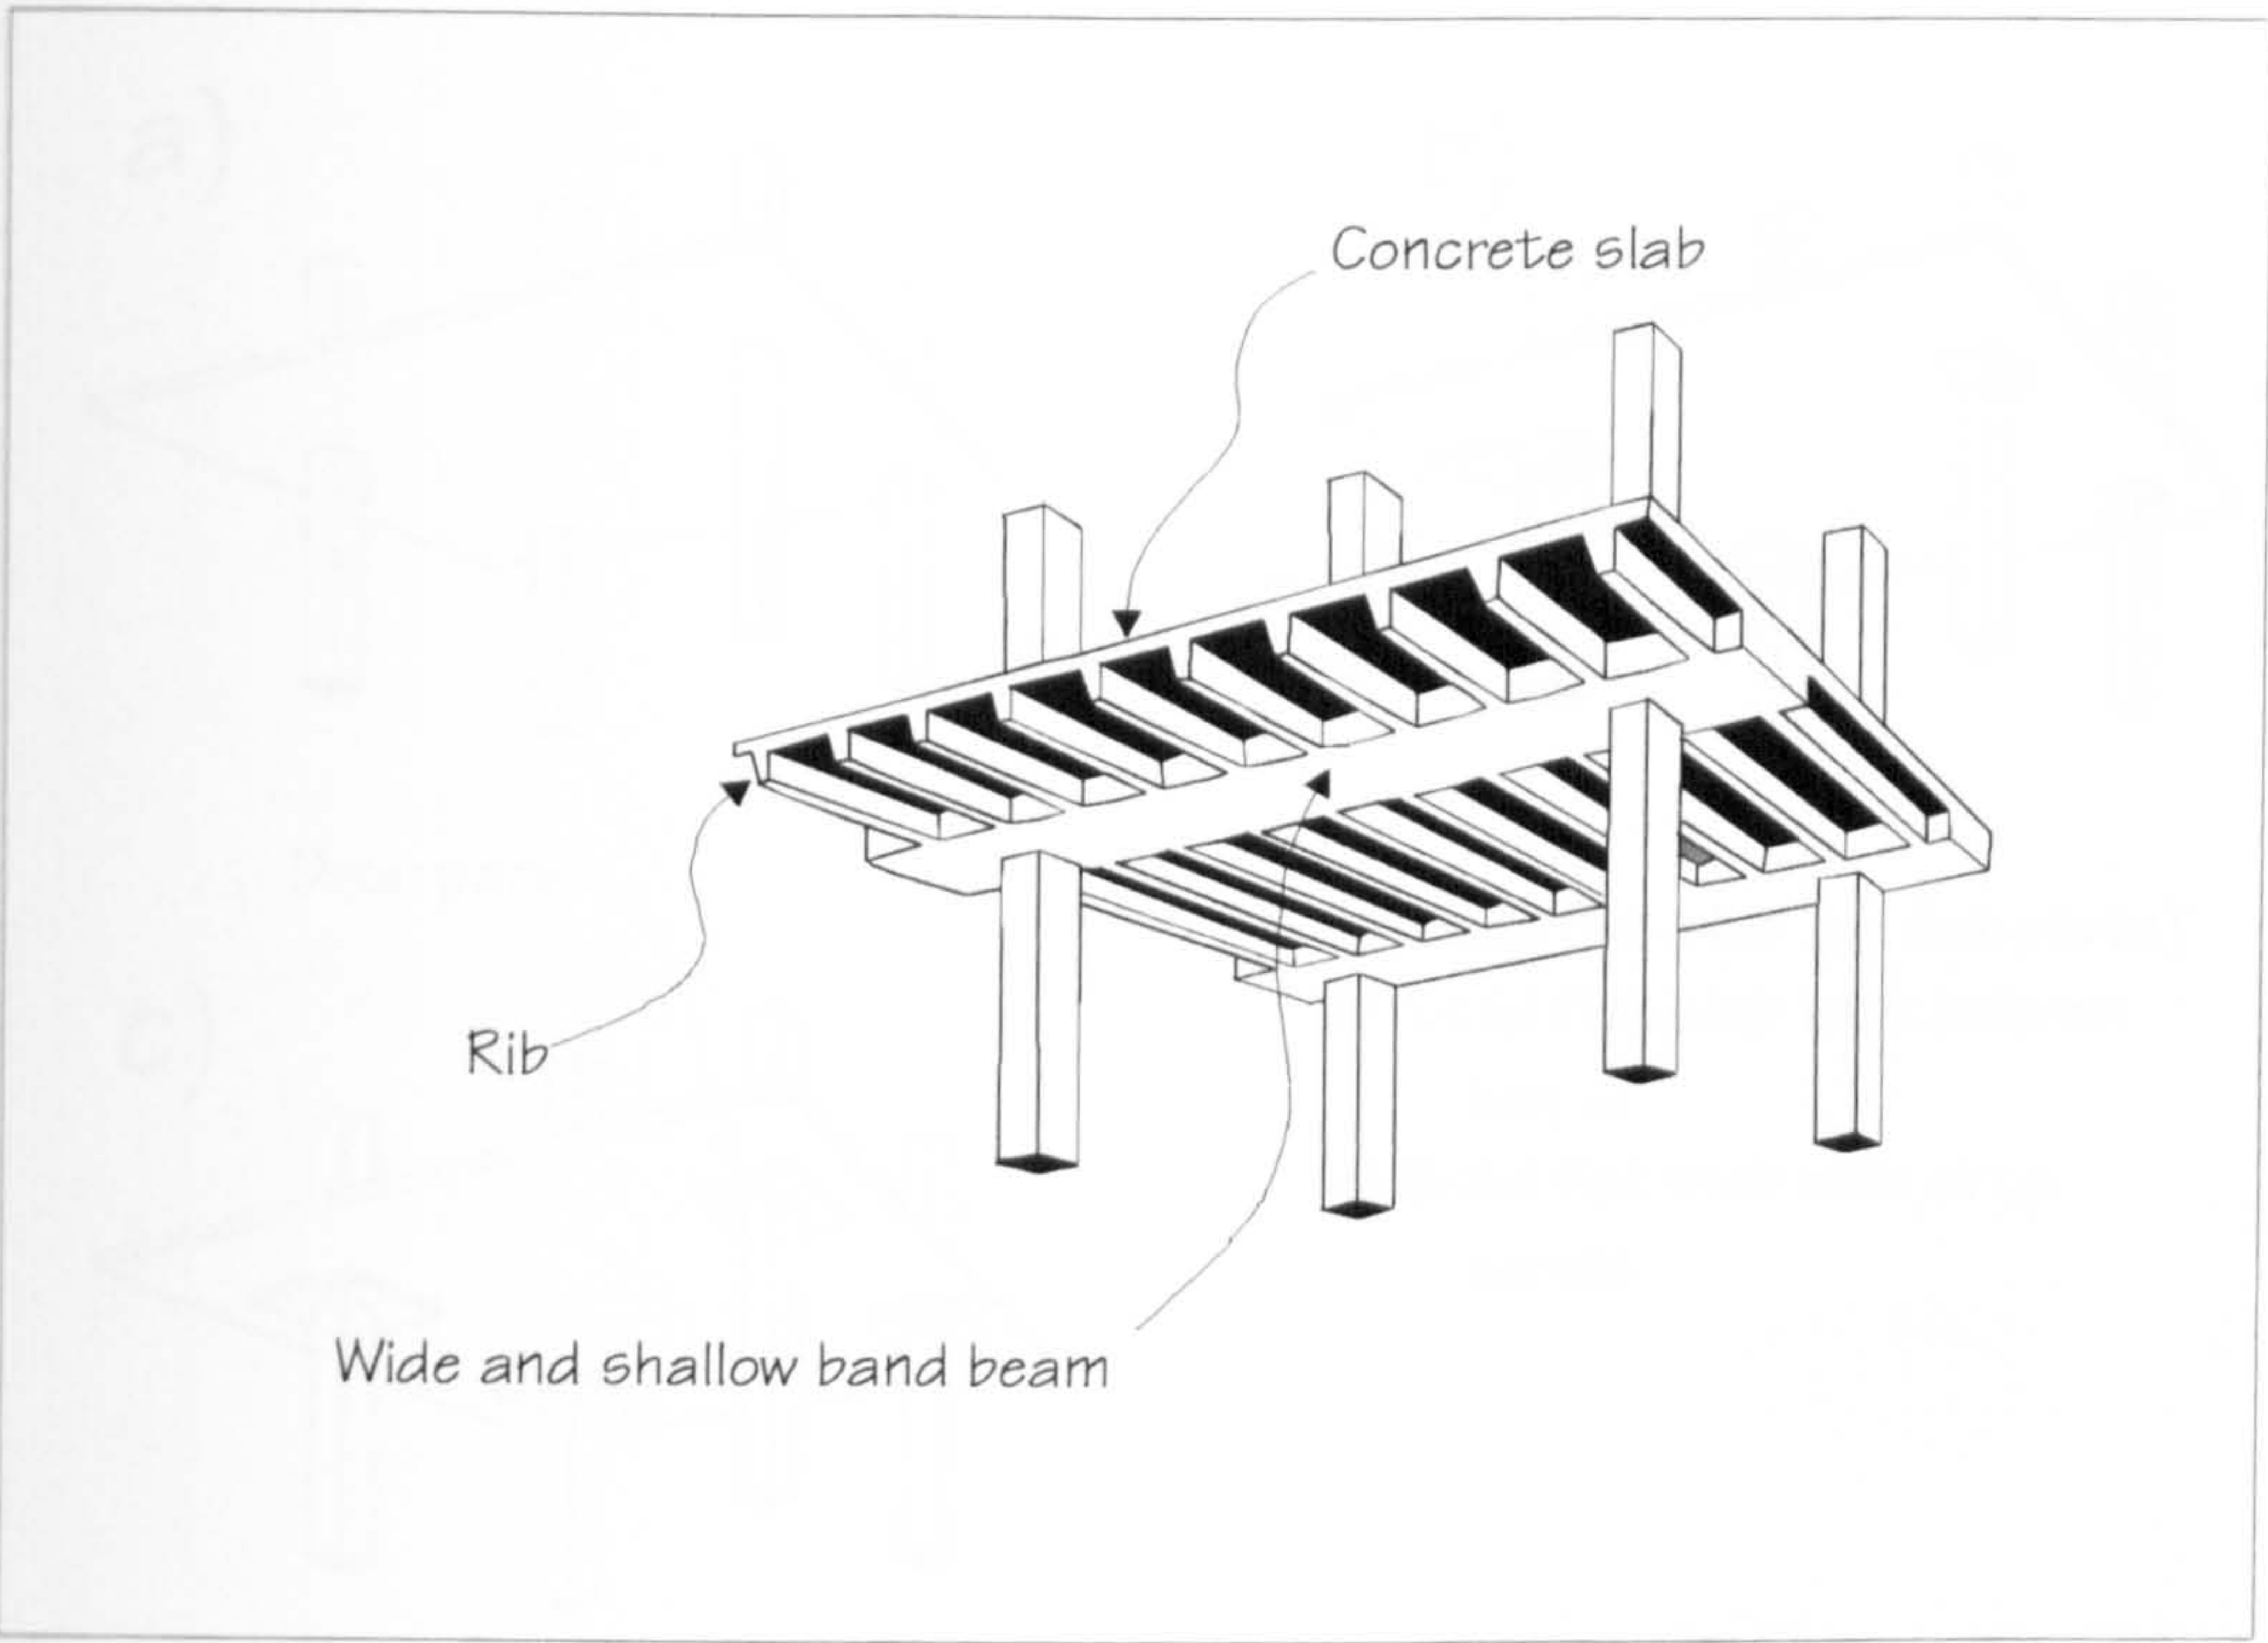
One-way spanning ribbed slab construction (after Stevenson, 1994).
